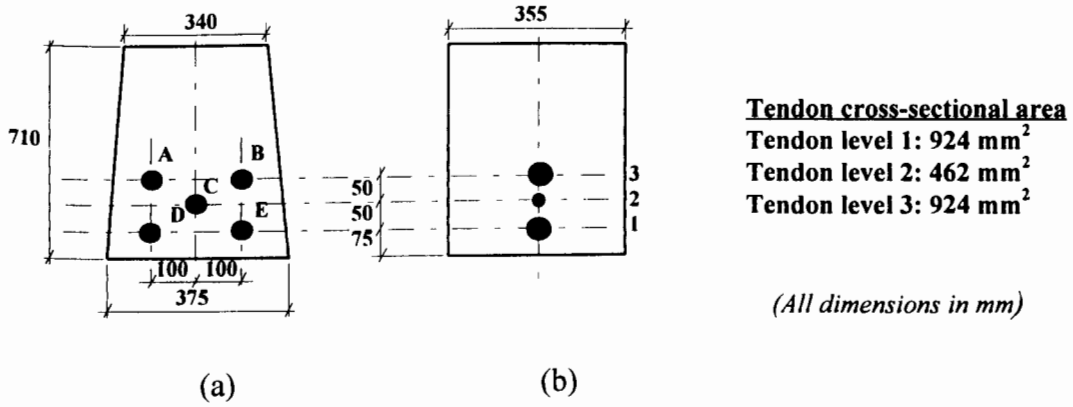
Cross-section at midspan of Botley beam - (a) actual cross-section, (b) modelled cross-section
